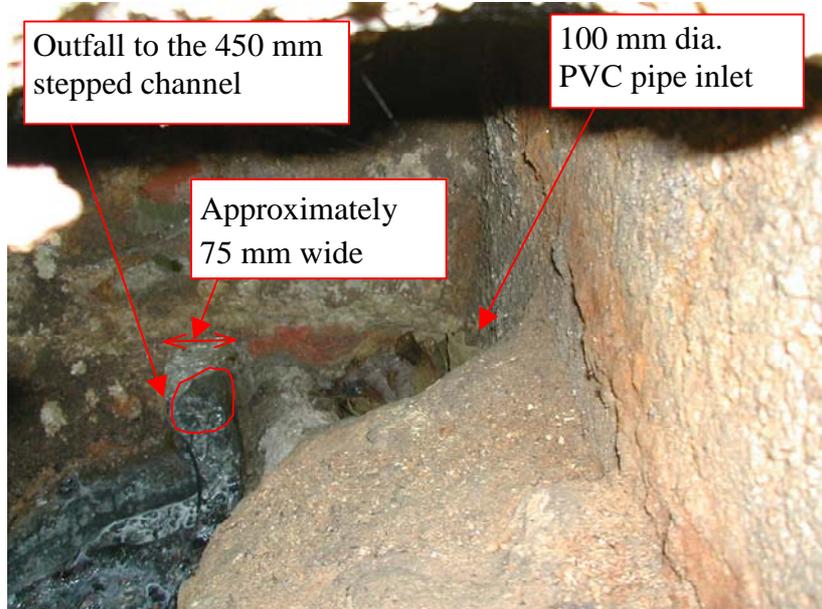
View inside the 1.2 m x 1.2 m Catchpit at the Crest of Slope No. 11NE-B/FR249 (Photograph taken on 24 September 2002)
